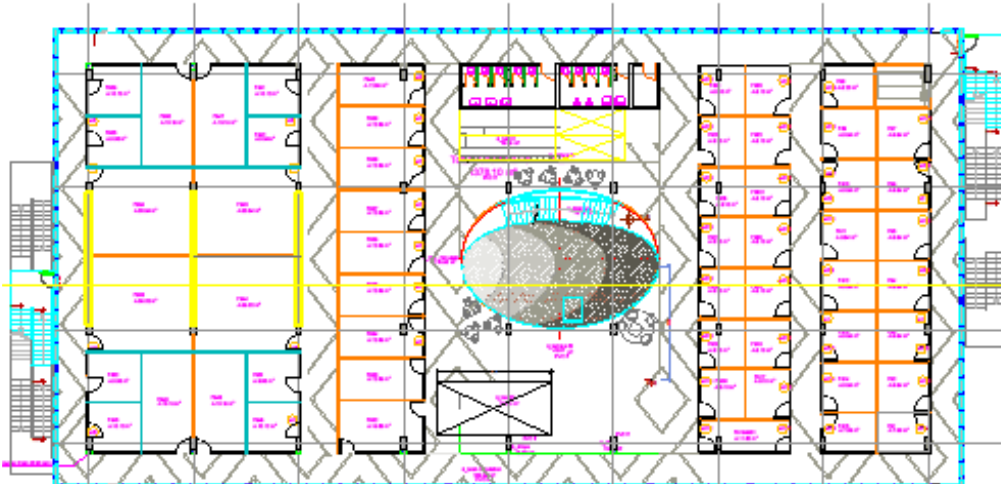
Lideta Mercato floor plan from ground floor to terrace
